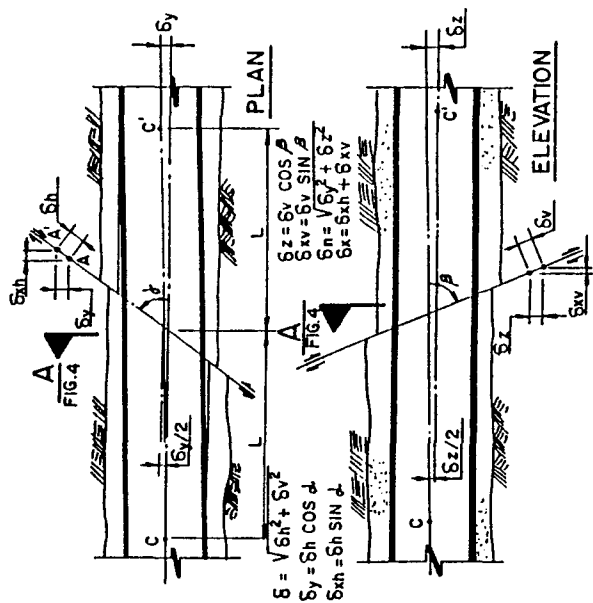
Plan and Elevation Views of a Pipeline Subjected to Strike and Dip-Slip (Ref. 5)
